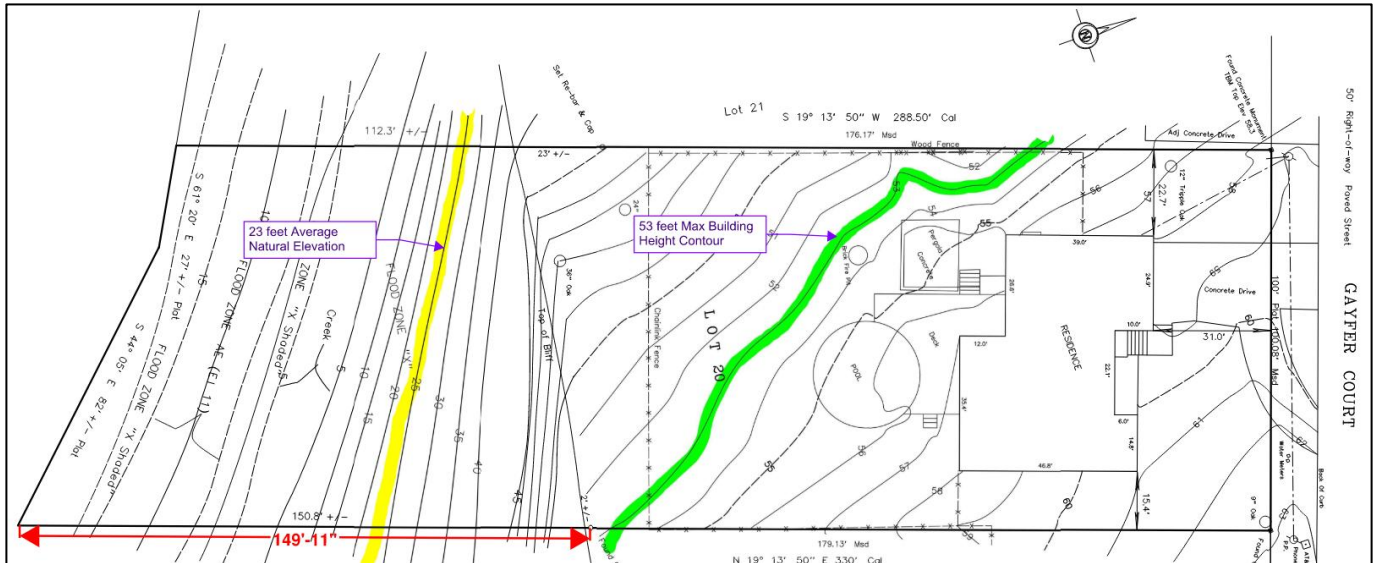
Existing Site Plan Illustrating Current Building Height Contours
